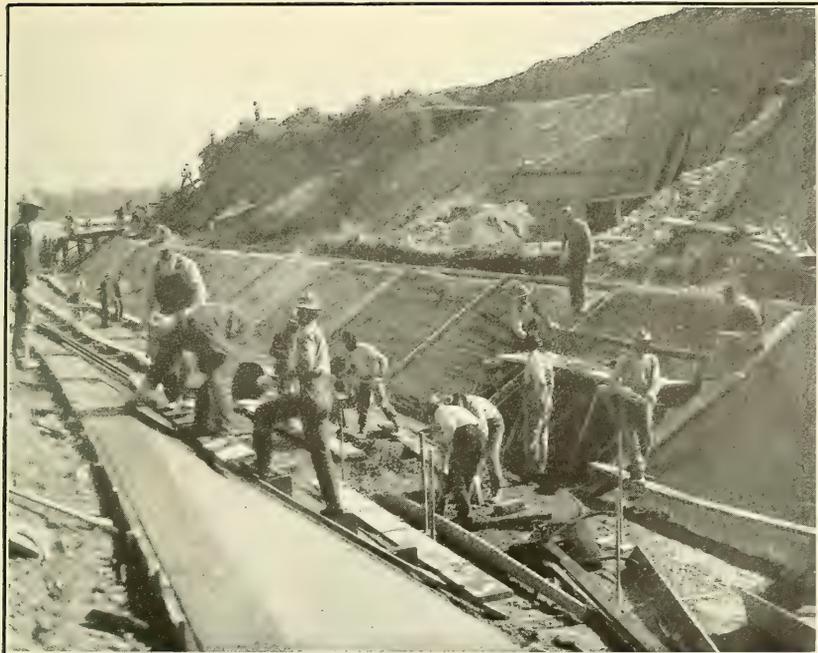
LAYING AND SURFACING CONCRETE ON SLOPES, RIDENBAUGH CANAL.
